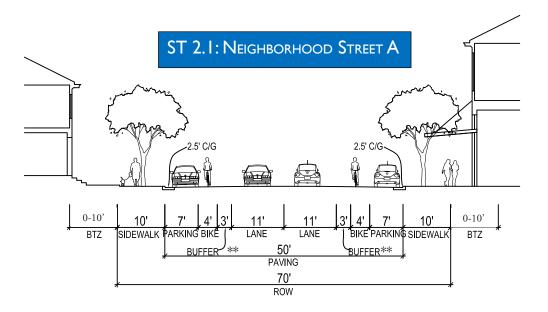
STREET TYPE 2.1: NEIGHBORHOOD STREET A
